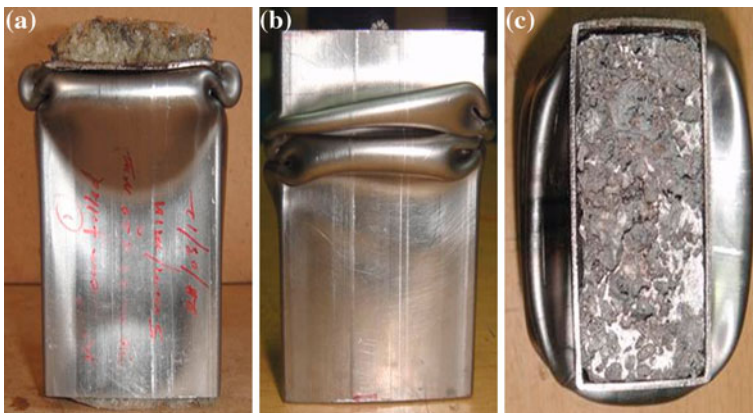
a Crush shapes of polymer foam filled section at 5 mm/min. b Al-metal foam filled section at 100 mm/min. c Al-foam filled section at 5 mm/min rate of compression
